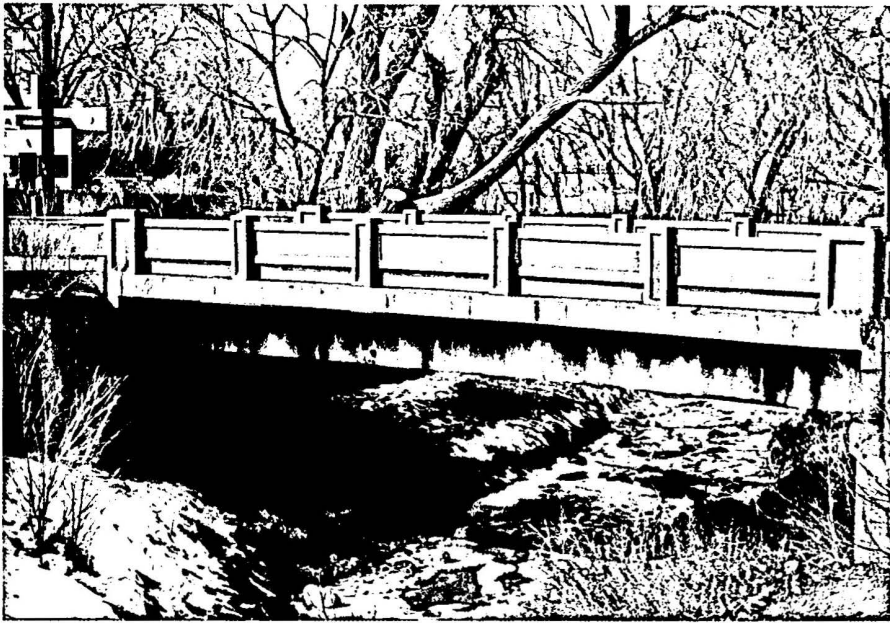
Delgado Street Bridge, Santa Fe (No. 4075)
